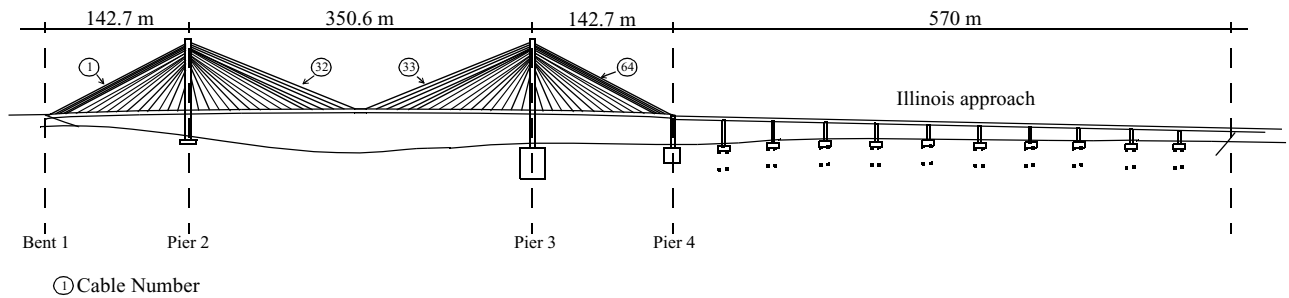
Schematic of the Cape Girardeau Bridge [1]
